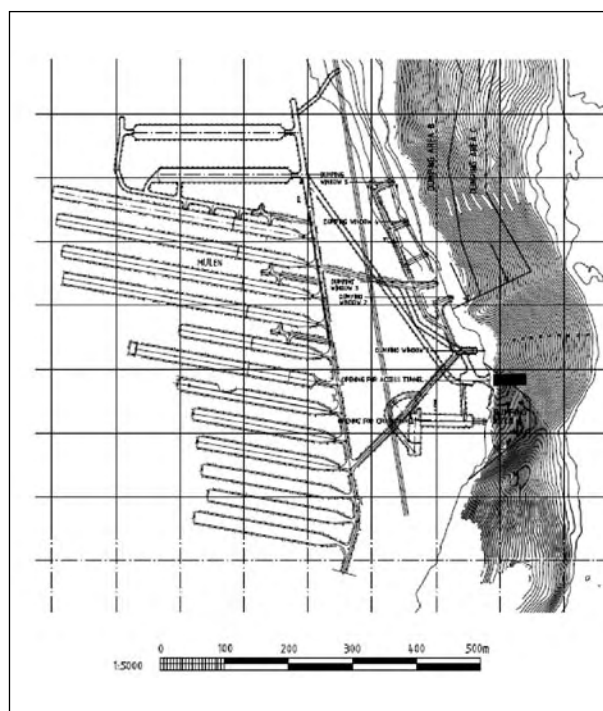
Map showing all excavations: 12 Caverns of 1st generation, cavern 13 and 14 of 2nd generation, A ventilation tunnel to the north, a crusher plant/storage at bottom right, and a system of access tunnels between the different levels.
